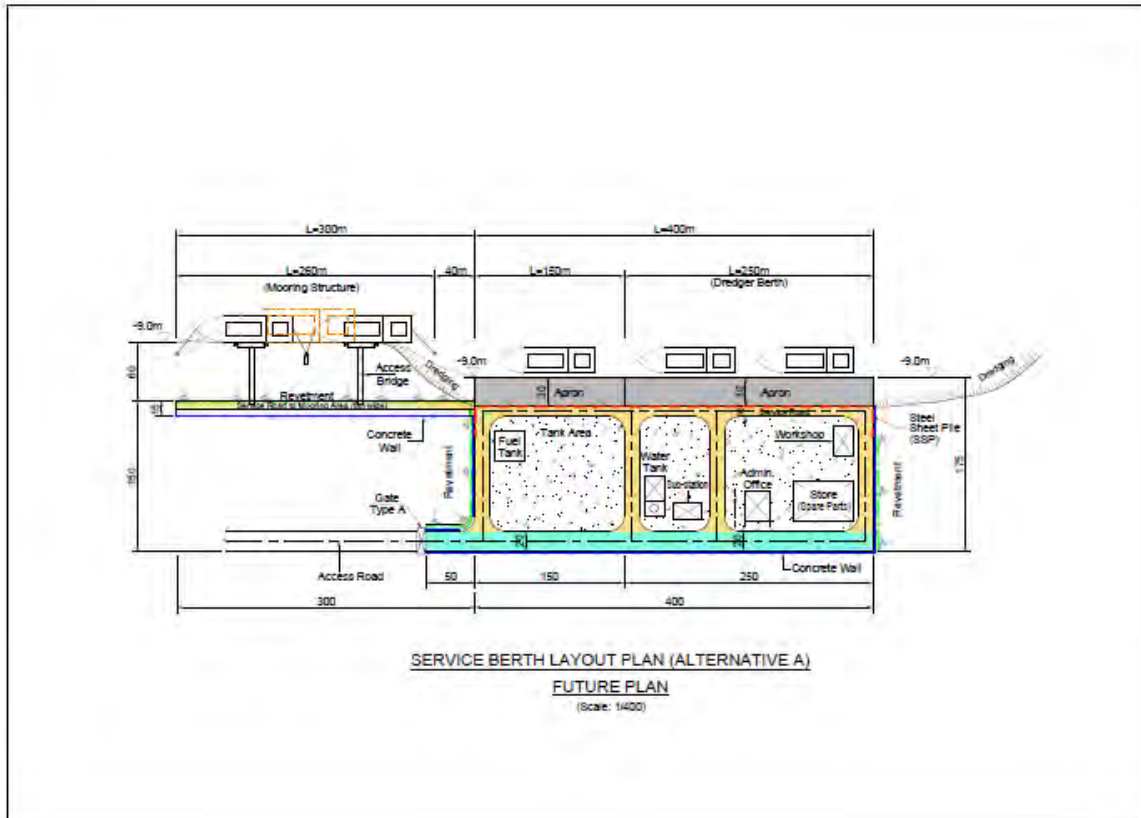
Proposed Future Plan of Dredger Berth
